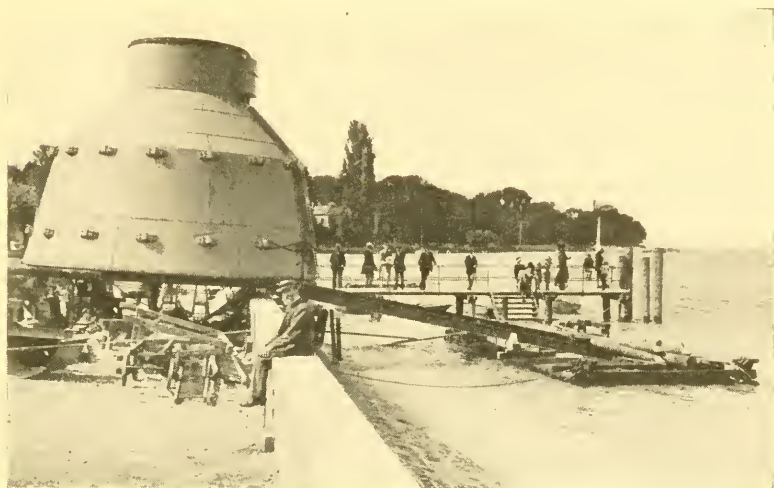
SHEET-IRON CAISSON ON SHORE, READY TO BE LAUNCHED.
